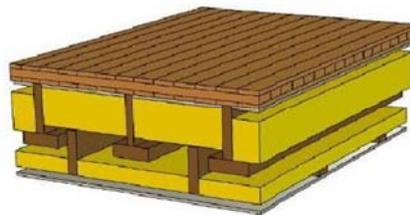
Limnologen floor element, please note the floor slab with the T-beams
